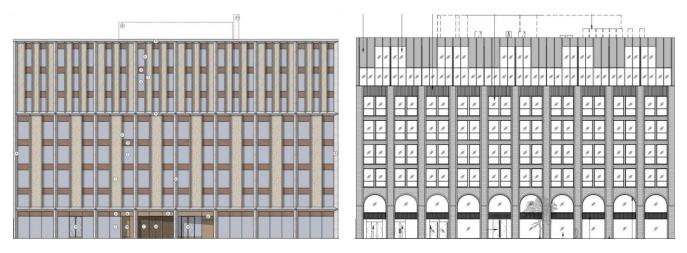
Approved Commercial Development – Rear elevation (as amended via P2022/1001/S73)
